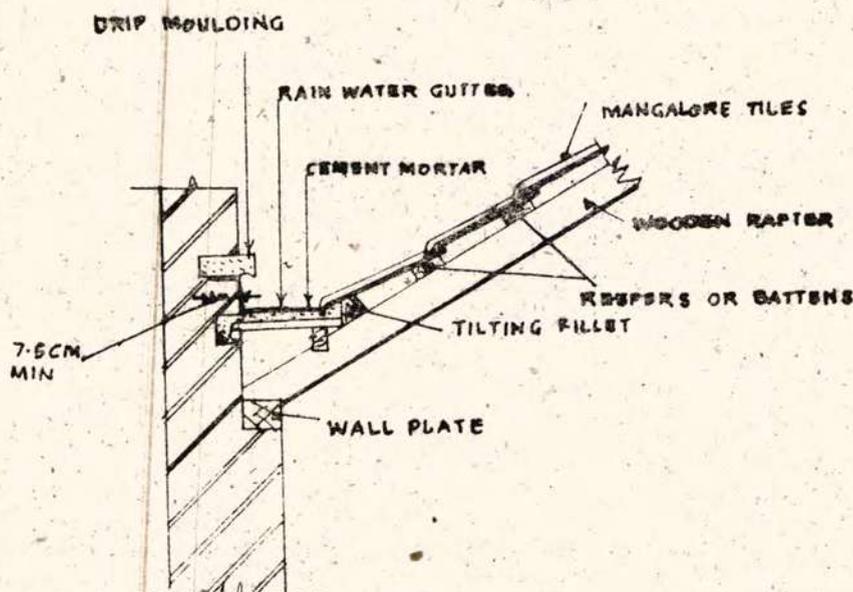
DETAIL AT THE JUNCTION OF THE ROOF WITH WALL
